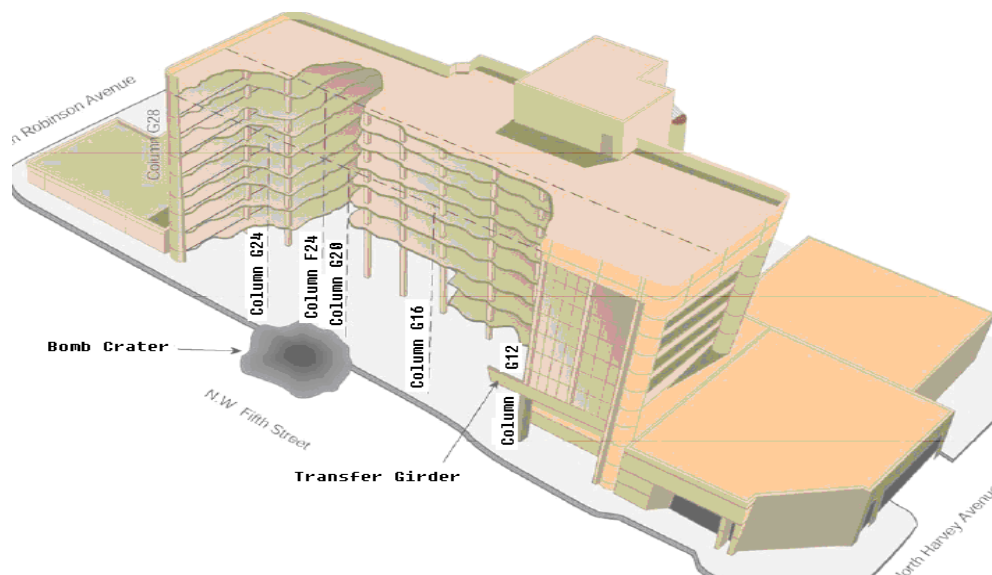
Murrah Building Sketch after collapse (Corley et.al., 1998)
